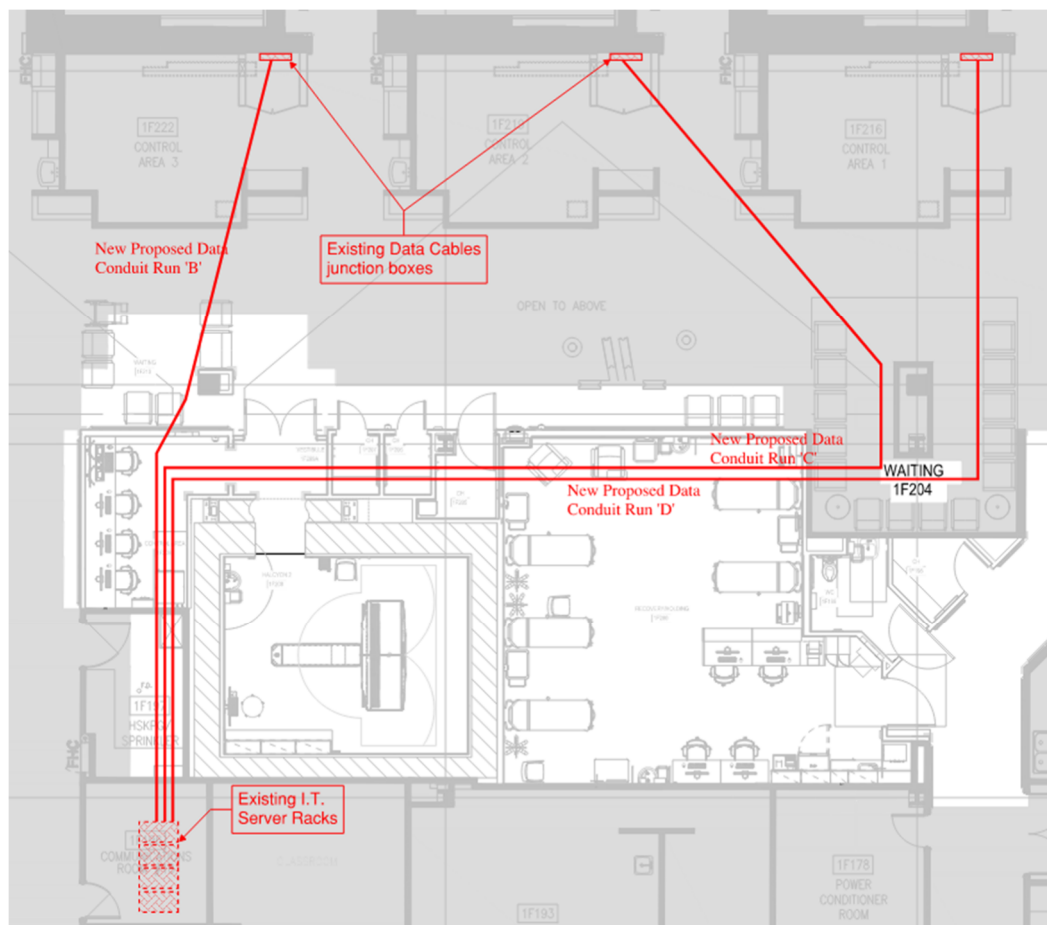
Proposed Data Conduits run to Bunker #1, #2, and #3
